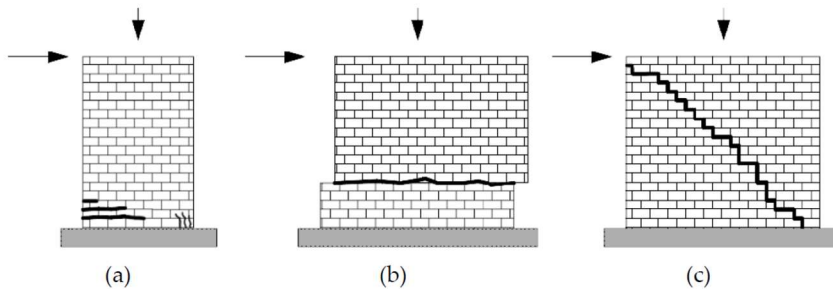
Typical masonry panel failure mechanism: (a) rocking, (b) shear sliding and (c) shear diagonal cracking [156].
